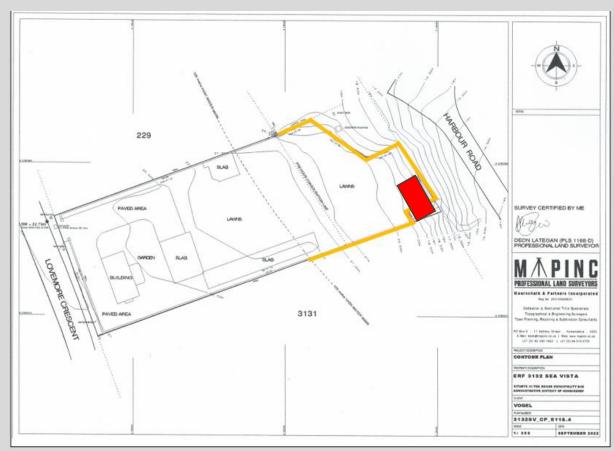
Remainder of boundary wall to be constructed (highlighted in orange) and proposed deck with storage area (highlighted in red).
